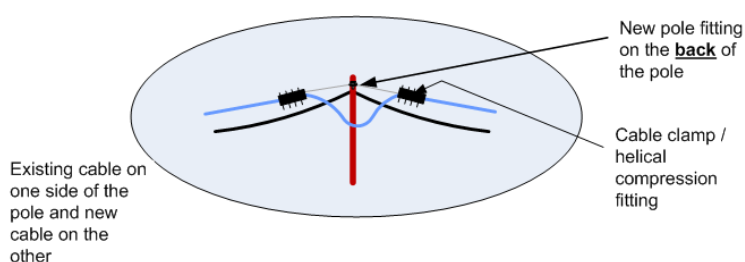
New ADSS cable deployed on the opposite side of the pole as the existing cable
